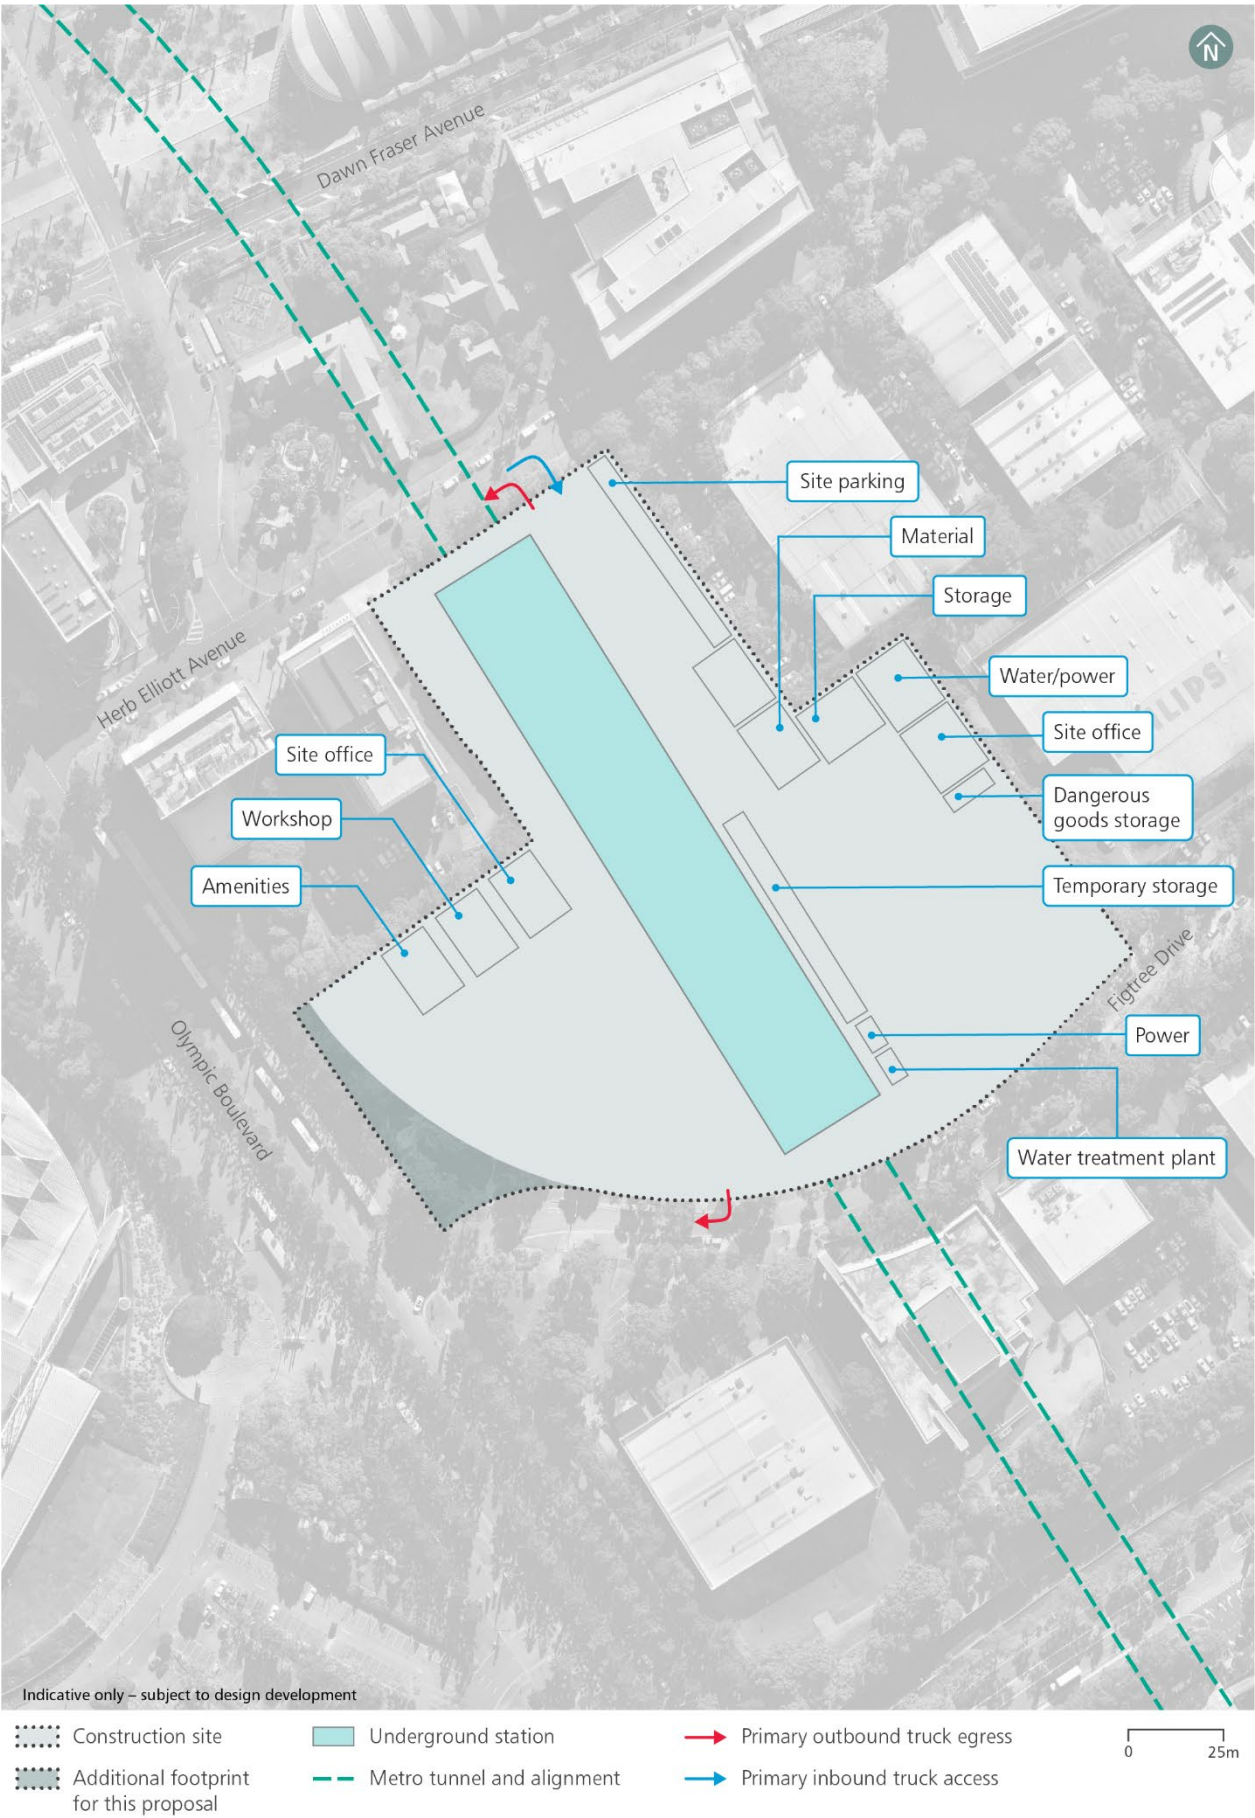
Sydney Olympic Park metro station indicative construction site layout
